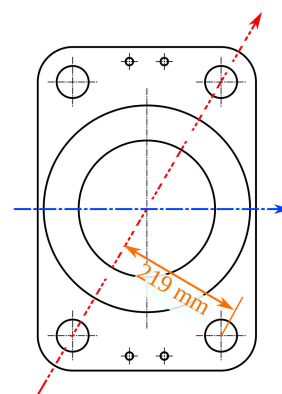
Layout of a steel column base PIII with an unfavorable position of the neutral axis when bending (red axis)
